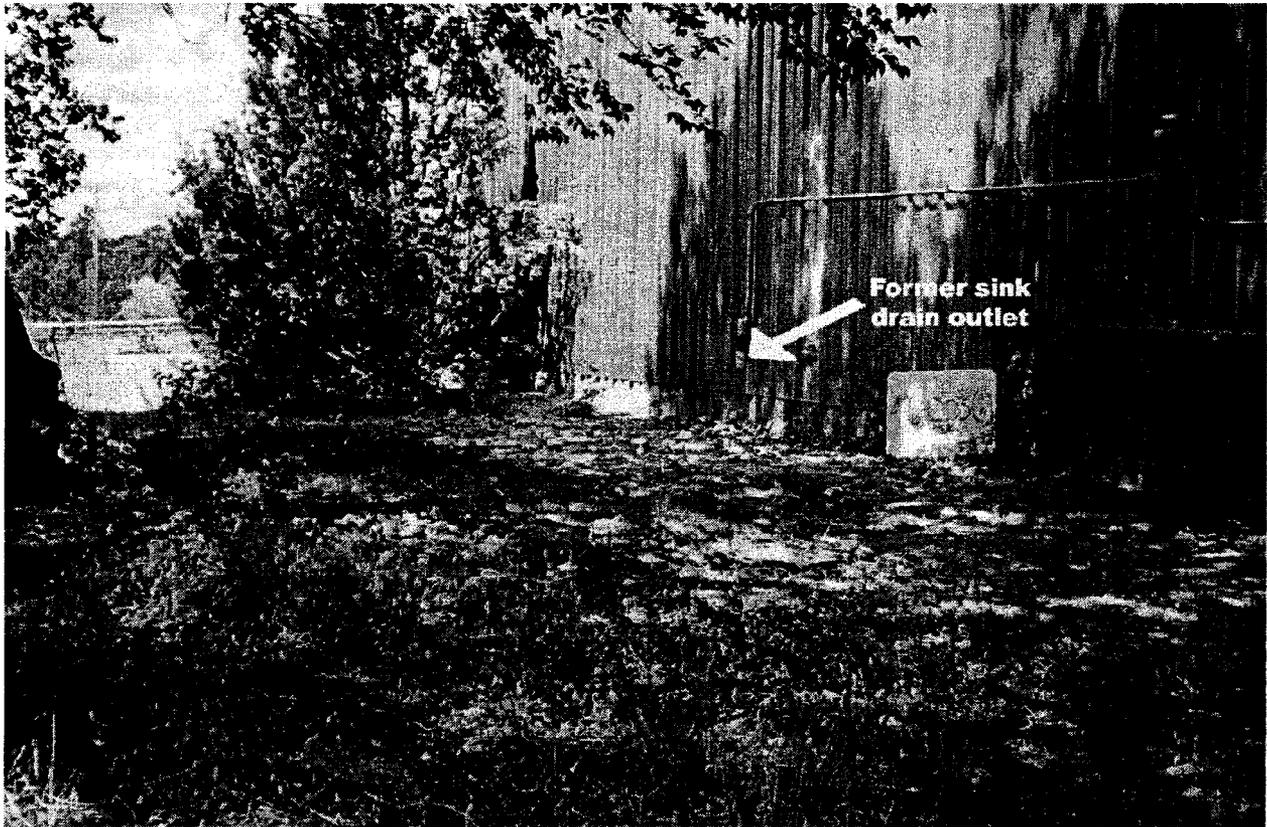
Eastern exterior wall of Building 46-77 showing former location of SWMU 46-003(h) drainpipe
